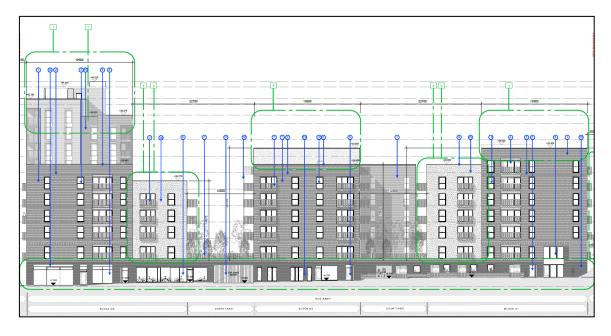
Typical Elevation Glazing to Wall Ratio - Blocks D1, D2 & D3 (North)
